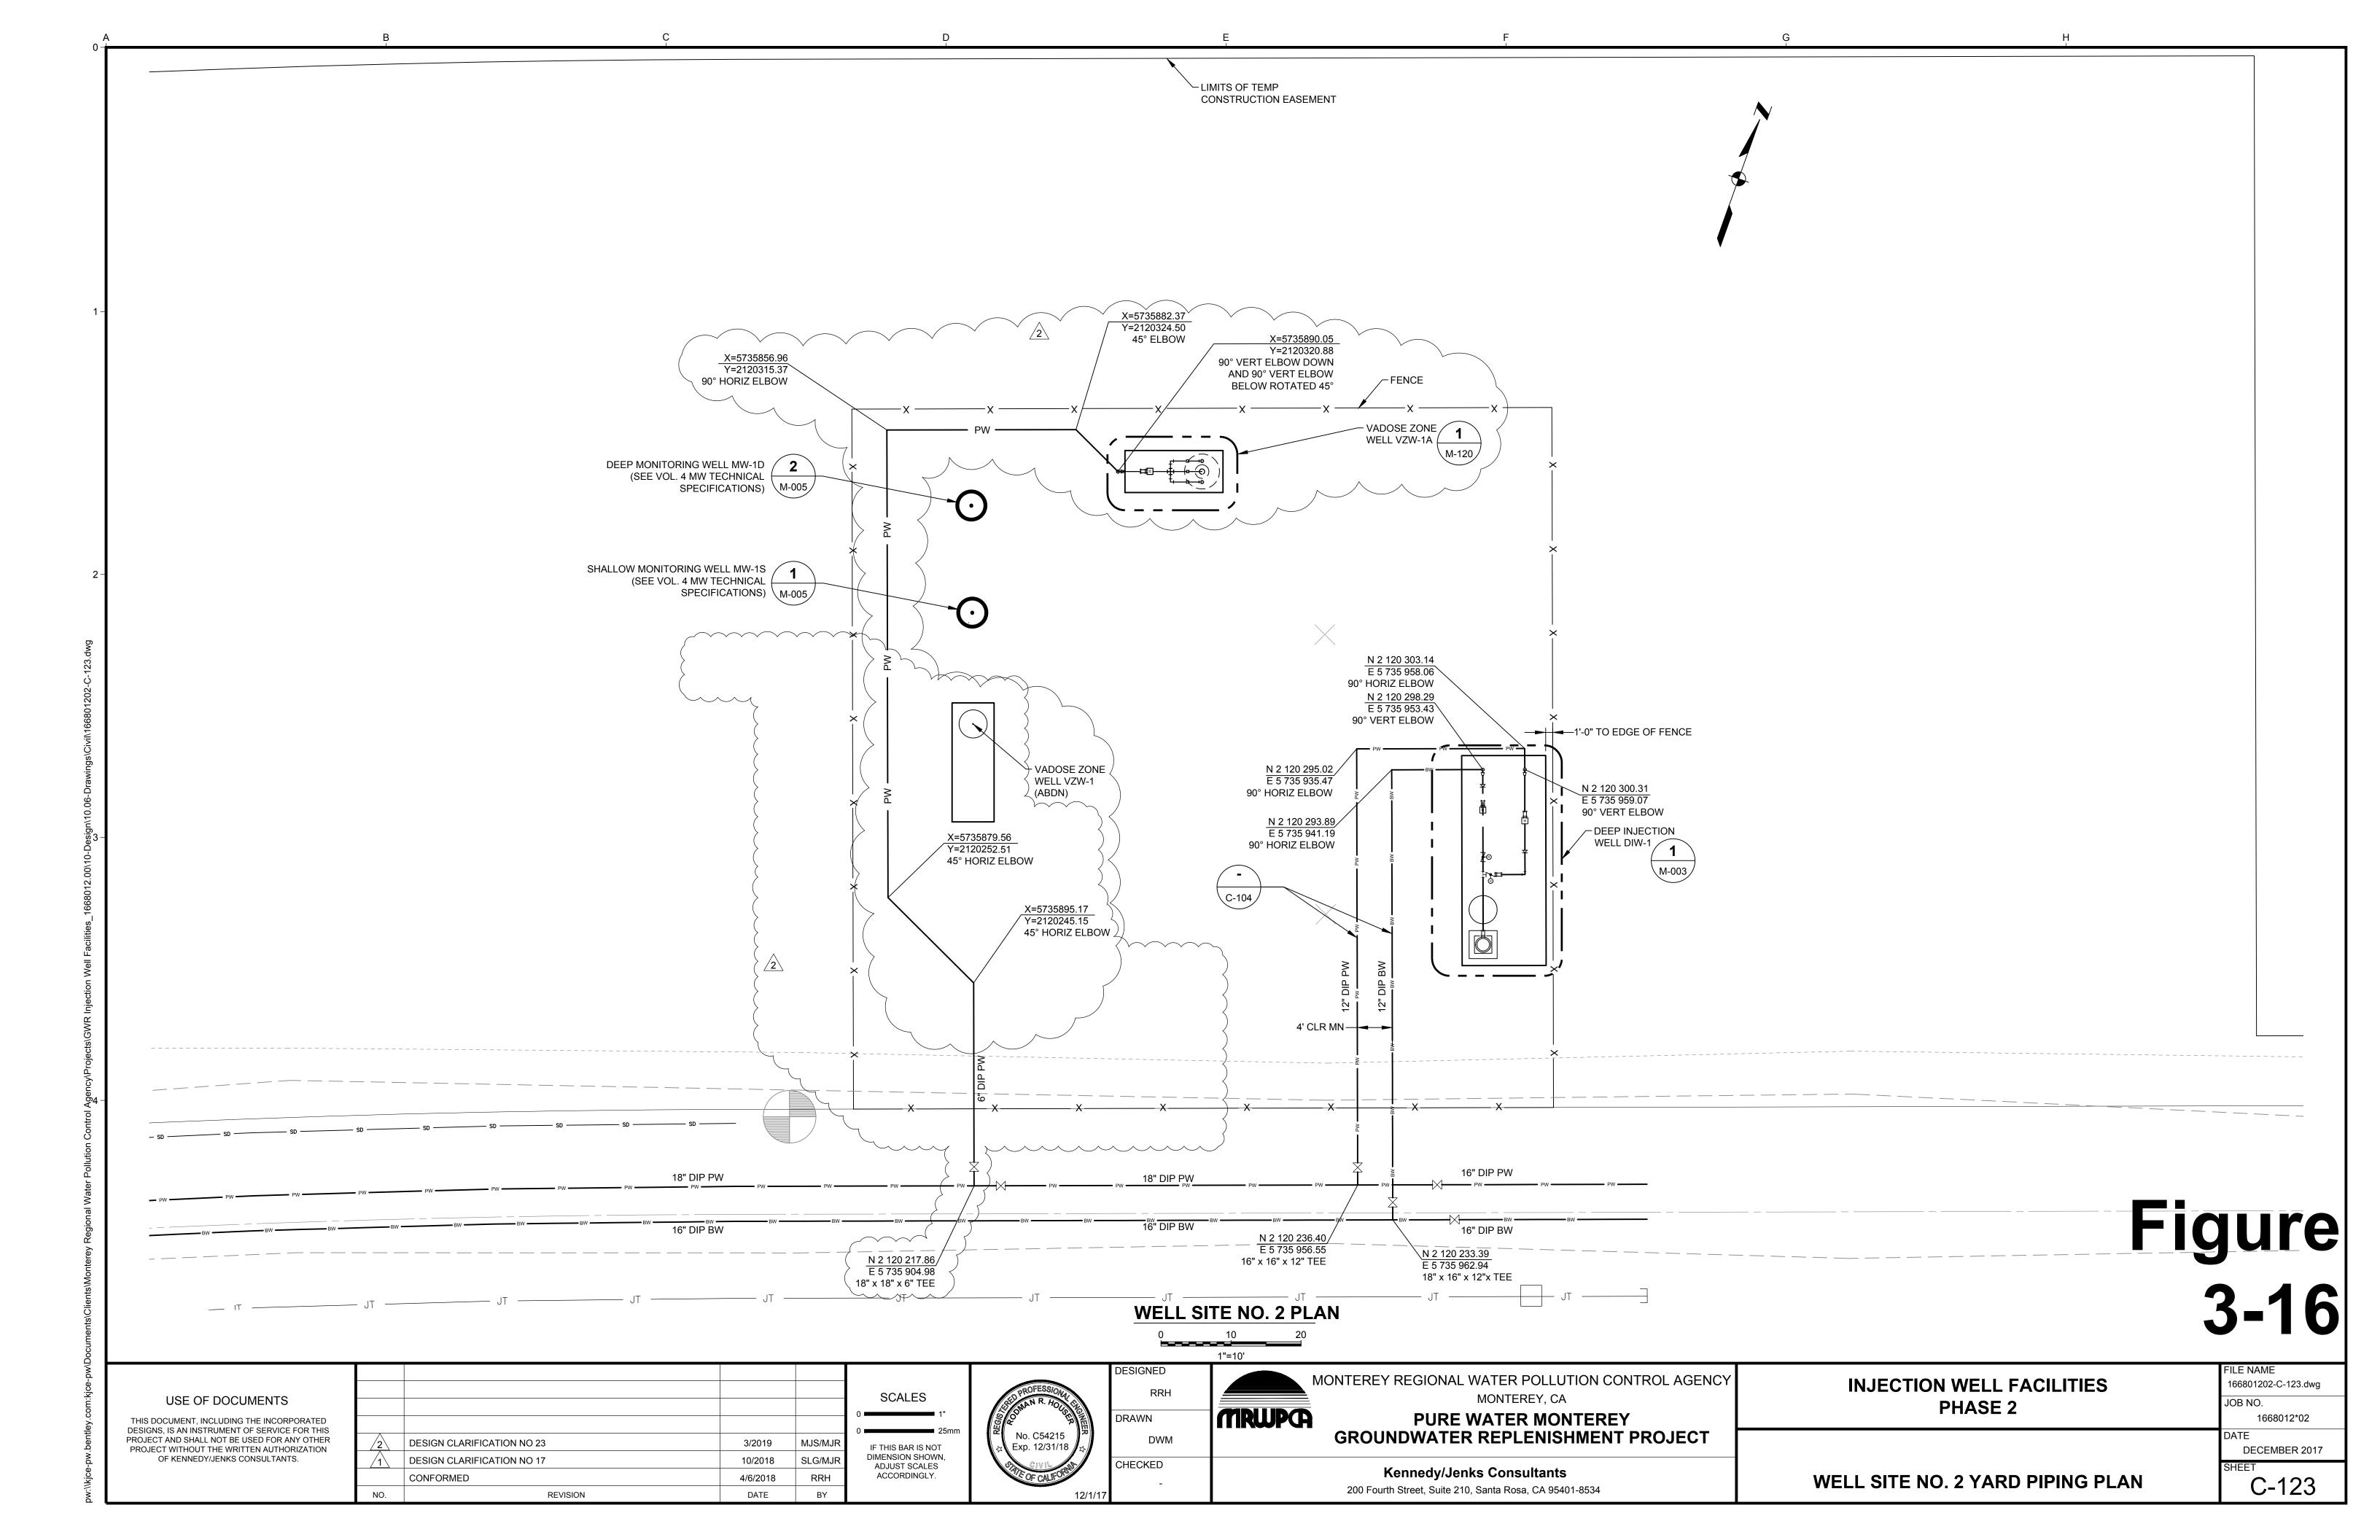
through 3-18 shows the Process Flow Diagram, Typical Yard Piping Plan (for original DIW-1 and VZW-1 site; known as Well Site 2), Typical DIW (and VZW-2 Specific) Plan and Sections. Together, the figures illustrate the following water supply pipeline and additional support facility features:
